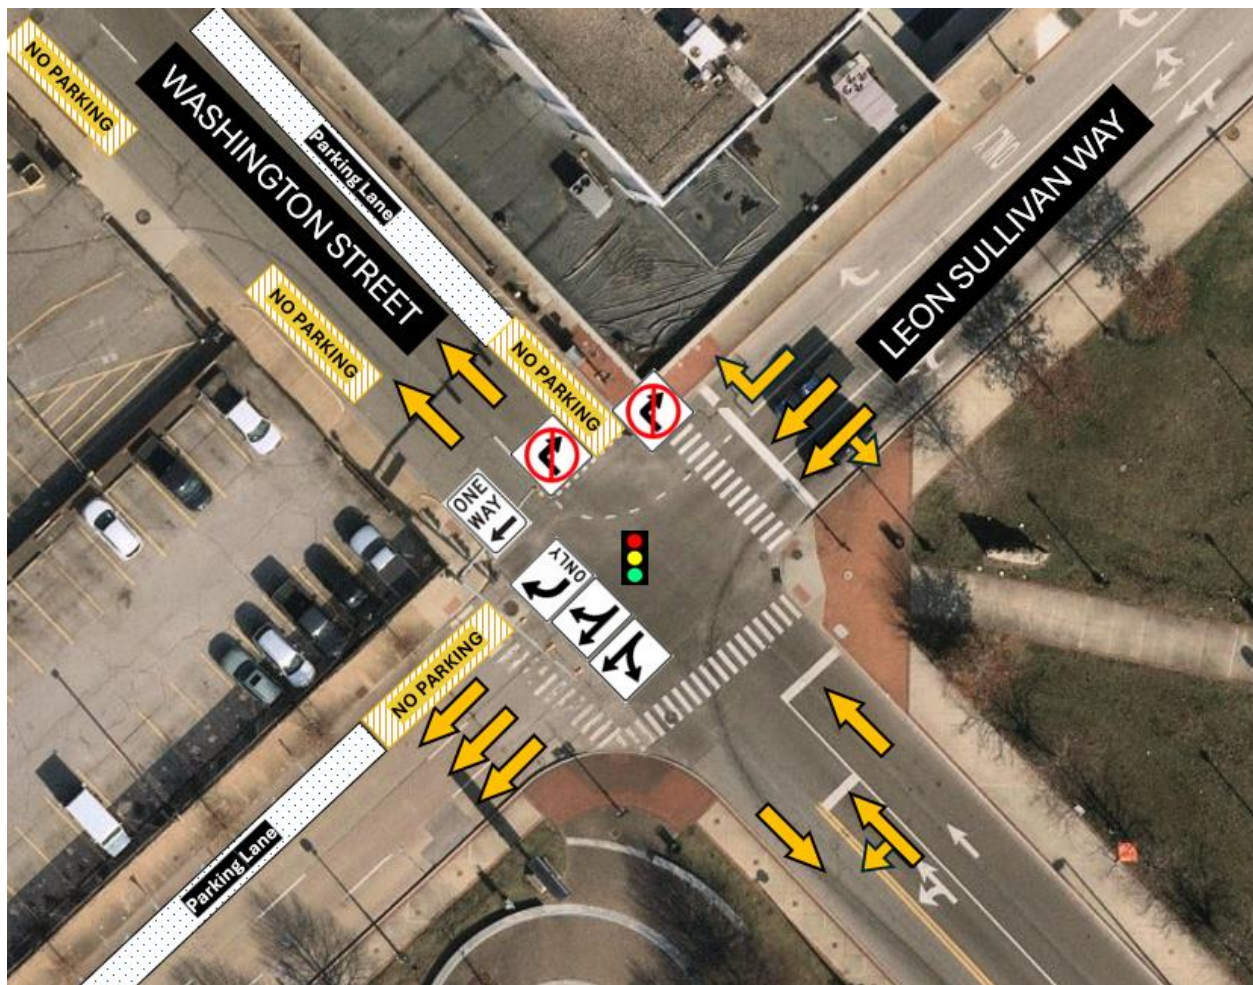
Washington Street and Leon Sullivan Way Signalized Intersection
